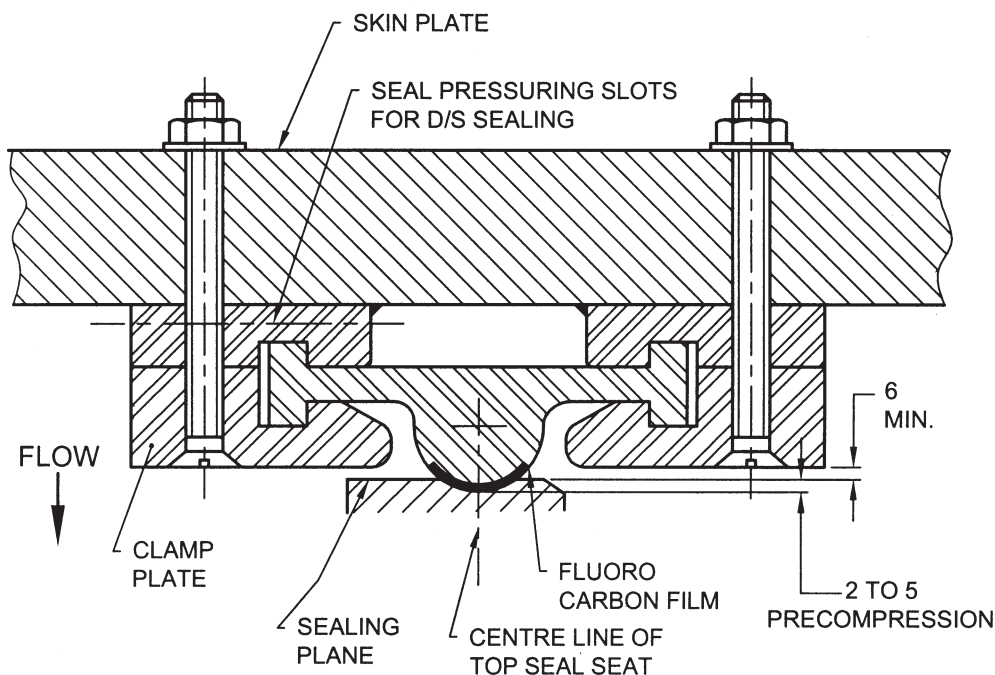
B ASSEMBLY DETAILS WITH DOUBLE STEM SEAL (DOWNSTREAM SEALING)
